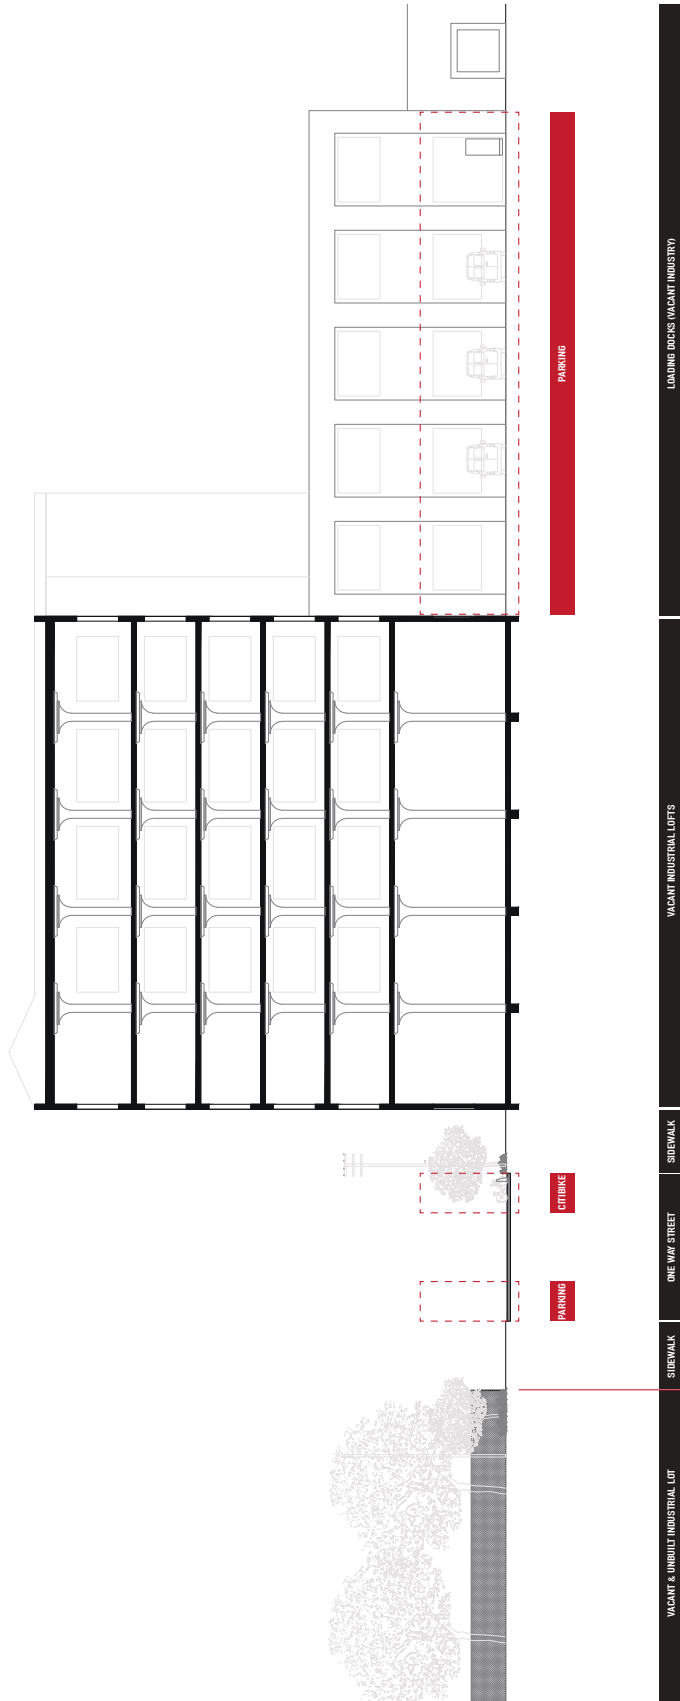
STREETSCAPE ACTIVITIES AT SITE 1 (R-SITE, RICHARDS STREET NORTH) : SOUTH-NORTH SECTION
